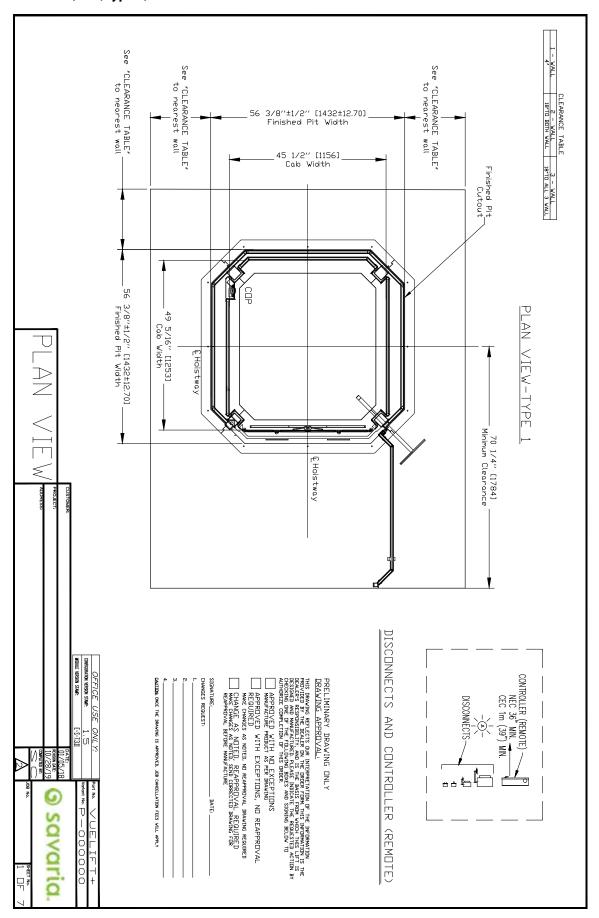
Pit/bottom floor/thru-floor view (OGL, type 1)
